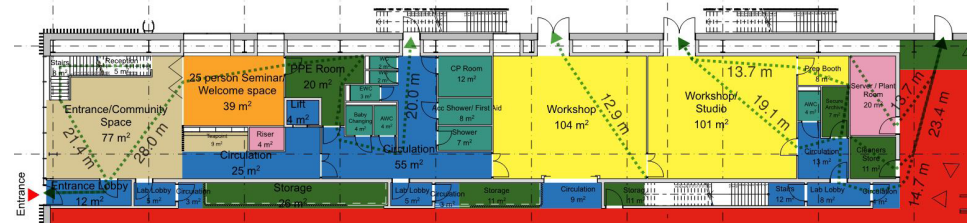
Travel Distance in the Office Area – Ground Floor
